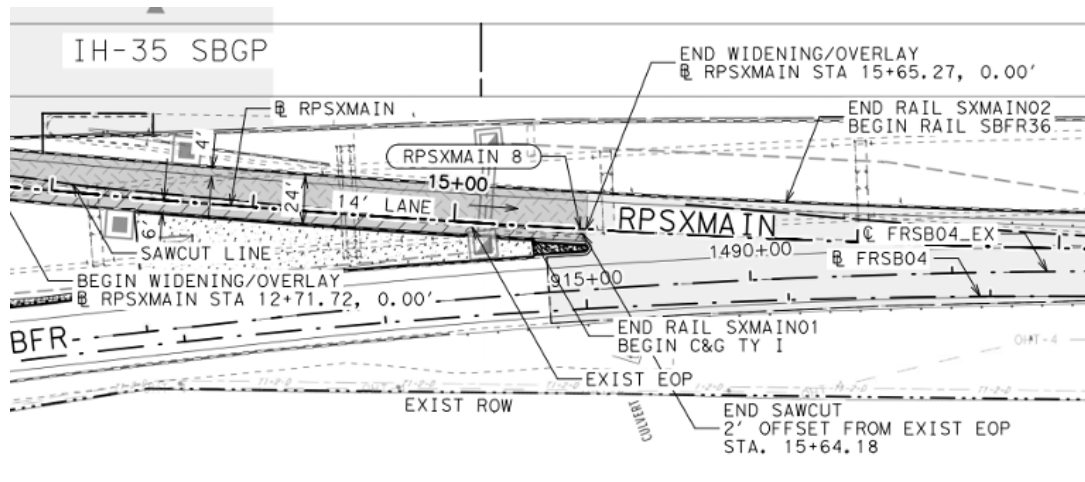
Construction Plans Example from Highway Project Plans (TxDOT, 2022c)
